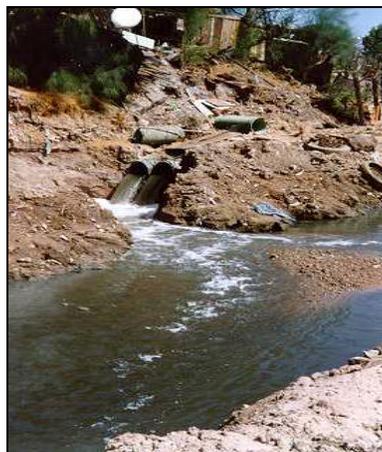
Raw sewage bypass from North Collector to Drain 134 (Aug 1992)
